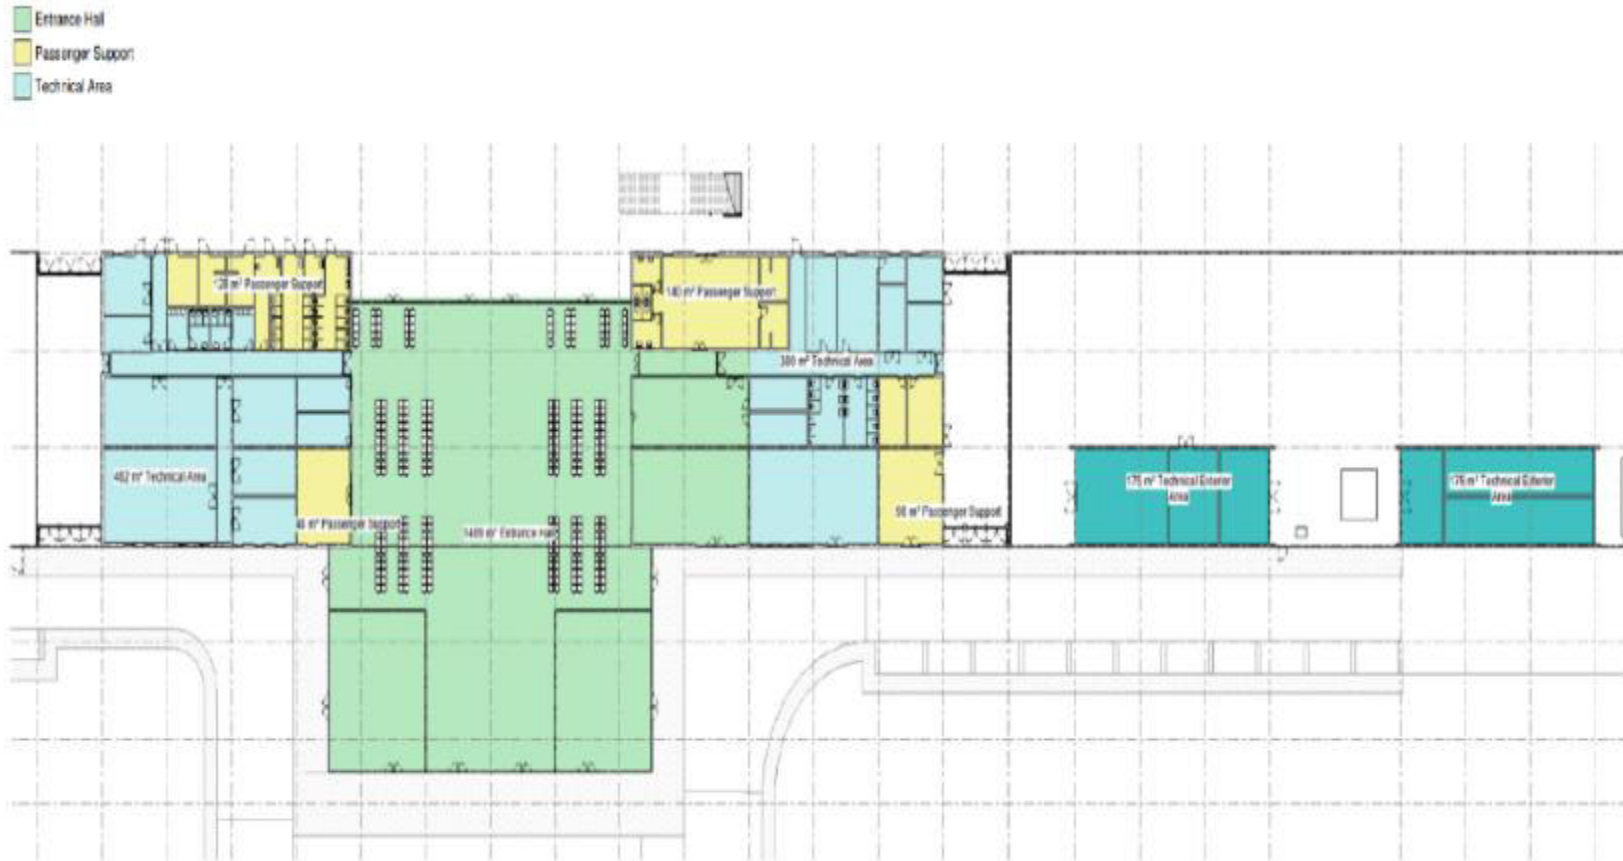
13: Typical layout of Stations (example showing a Type A station)
